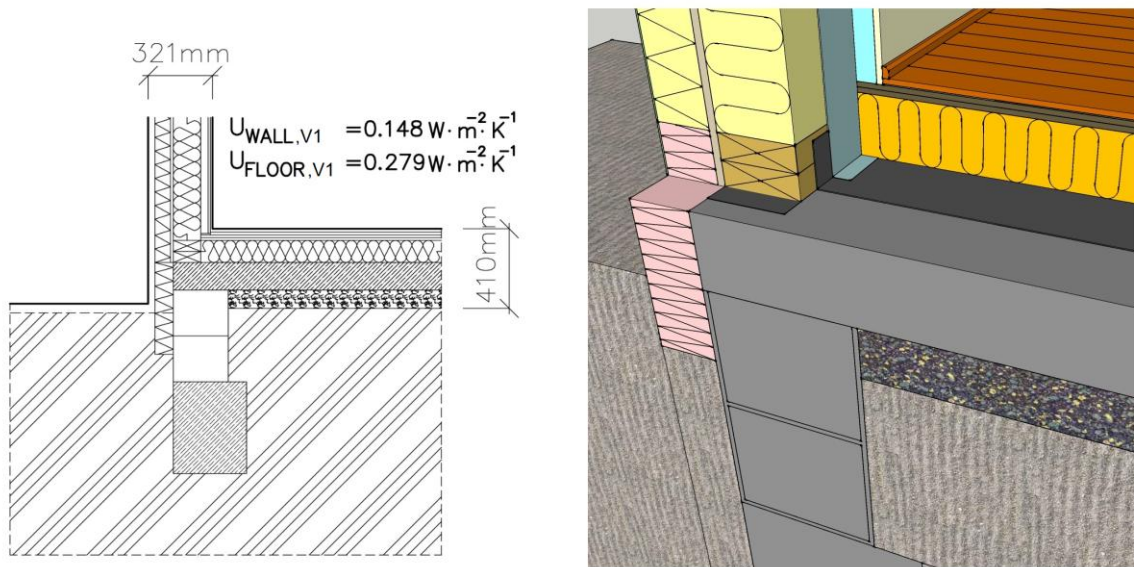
The wall and floor construction of diffusion closed wooden structure [author]
